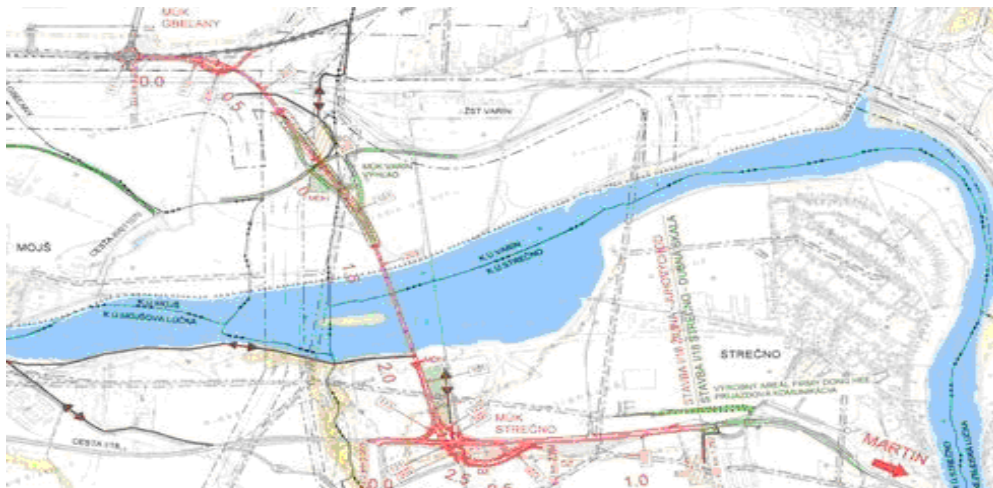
Planned connection of Road I/18 Žilina (southeast)
